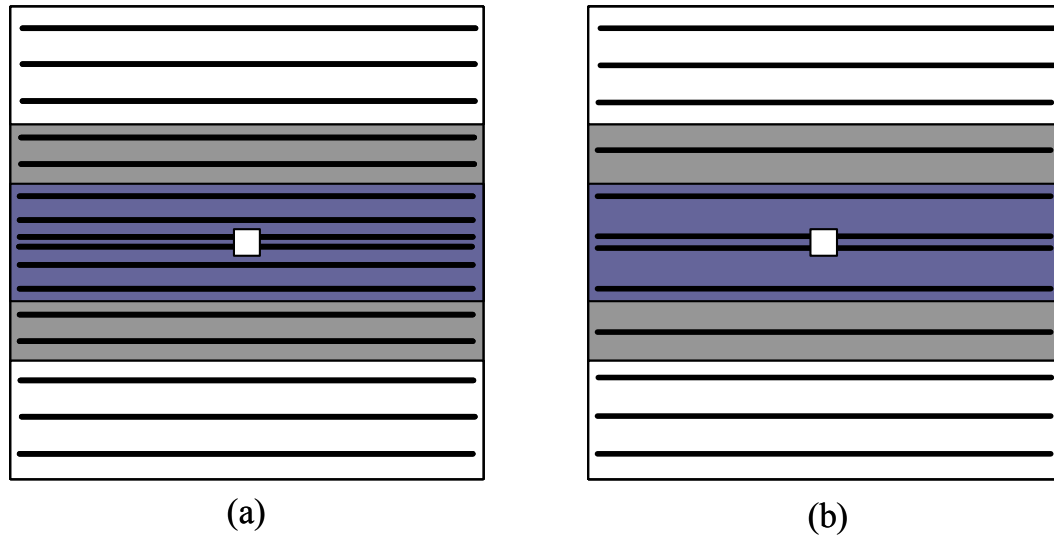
Prototype Structure Steel Reinforcing Bar Details: (a) Top Mat of Steel; and, (b) Bottom Mat of Steel
